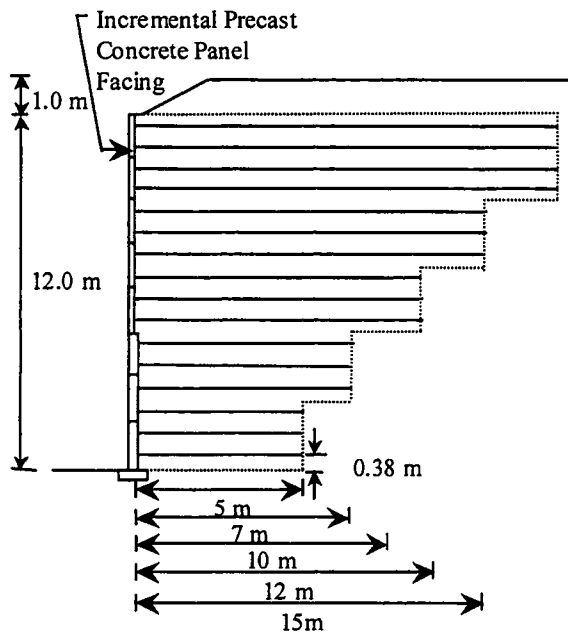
Asahigaoka, Japan, steel strip MSE wall (adopted from Bastick, 1984).
